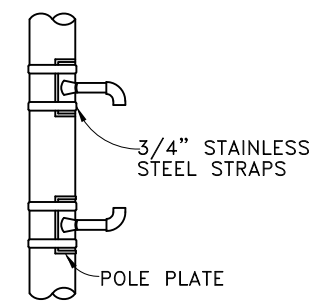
DETAIL OF MAST ARM MOUNTING FOR IN-LINE SIGNAL HEAD (3-SECTION, 4-SECTION OR 5-SECTION)
